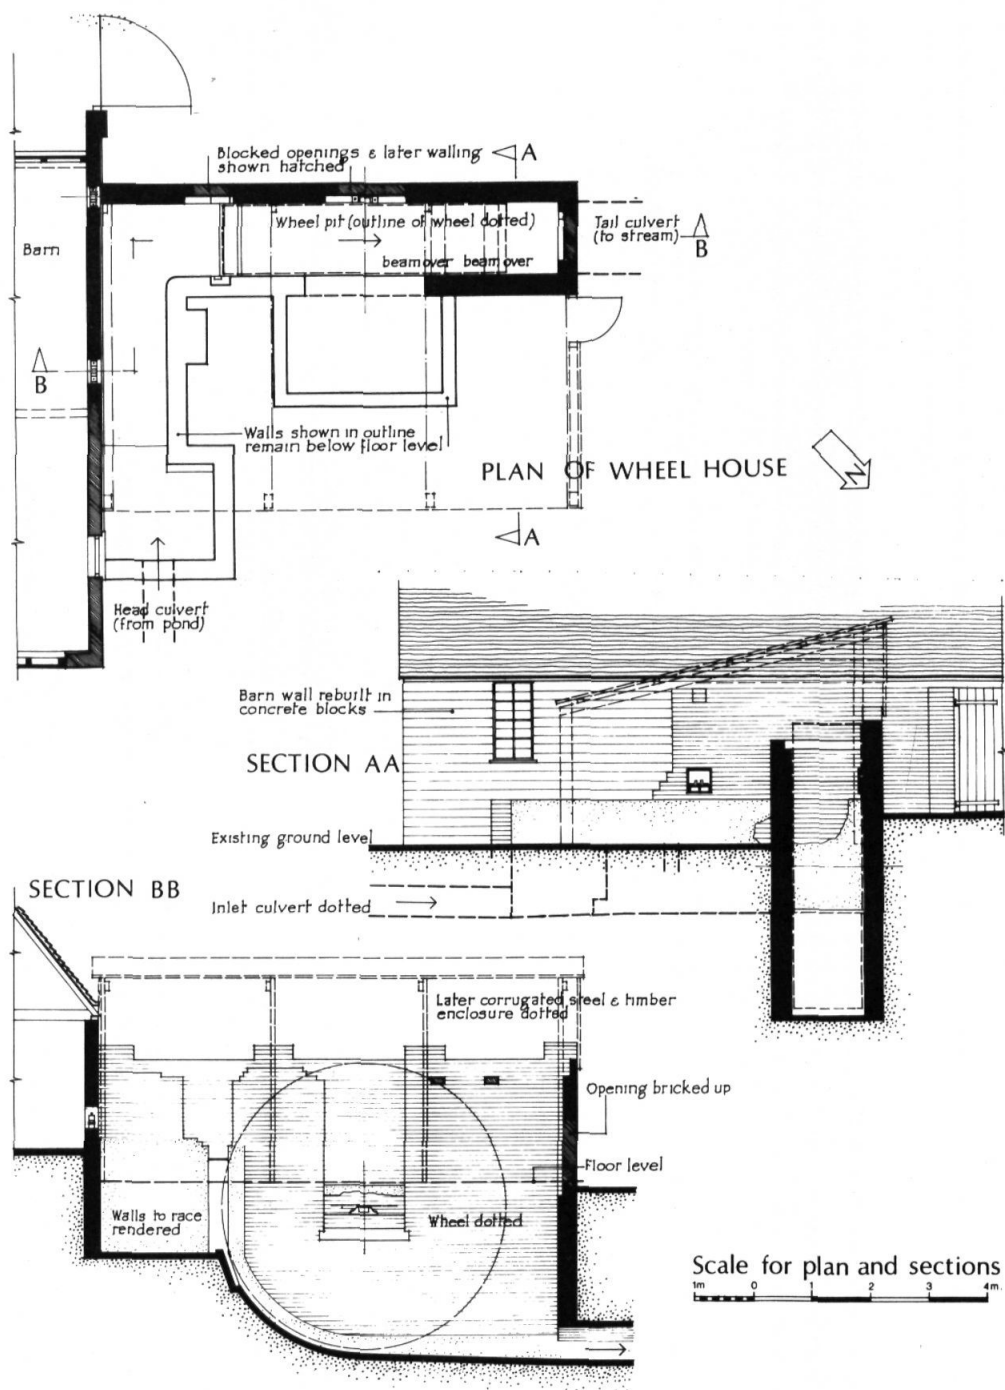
Brownwich Farm: plan and sections of the wheel house. Drawn by John Reynolds.
